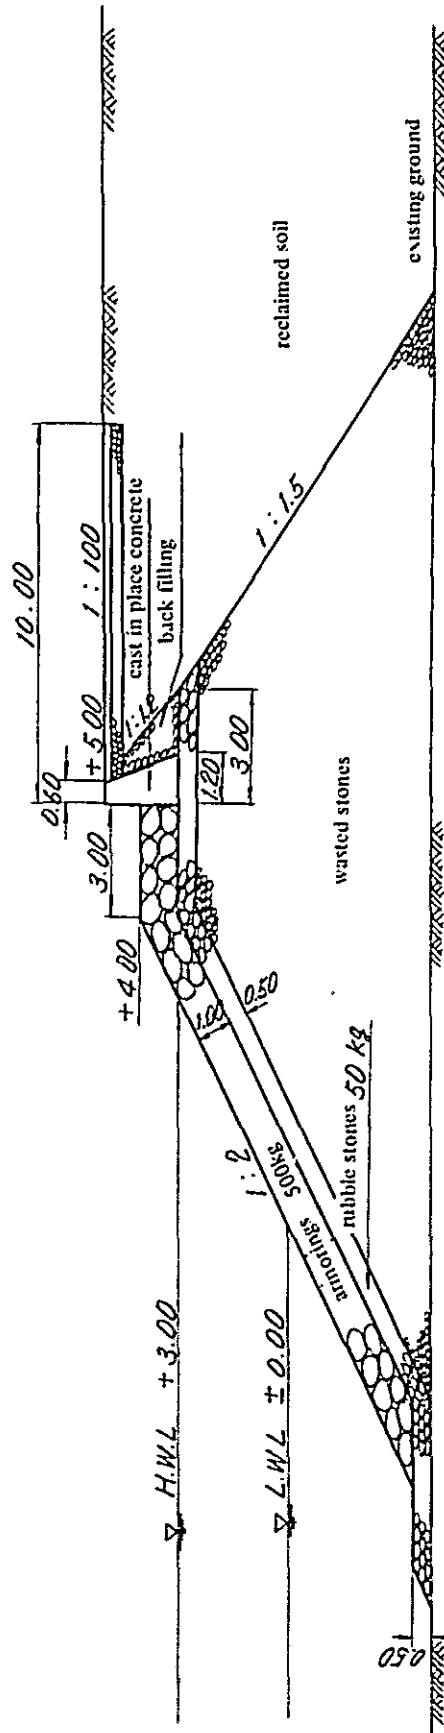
Standard Cross Section of Revetment (South Caldera)
